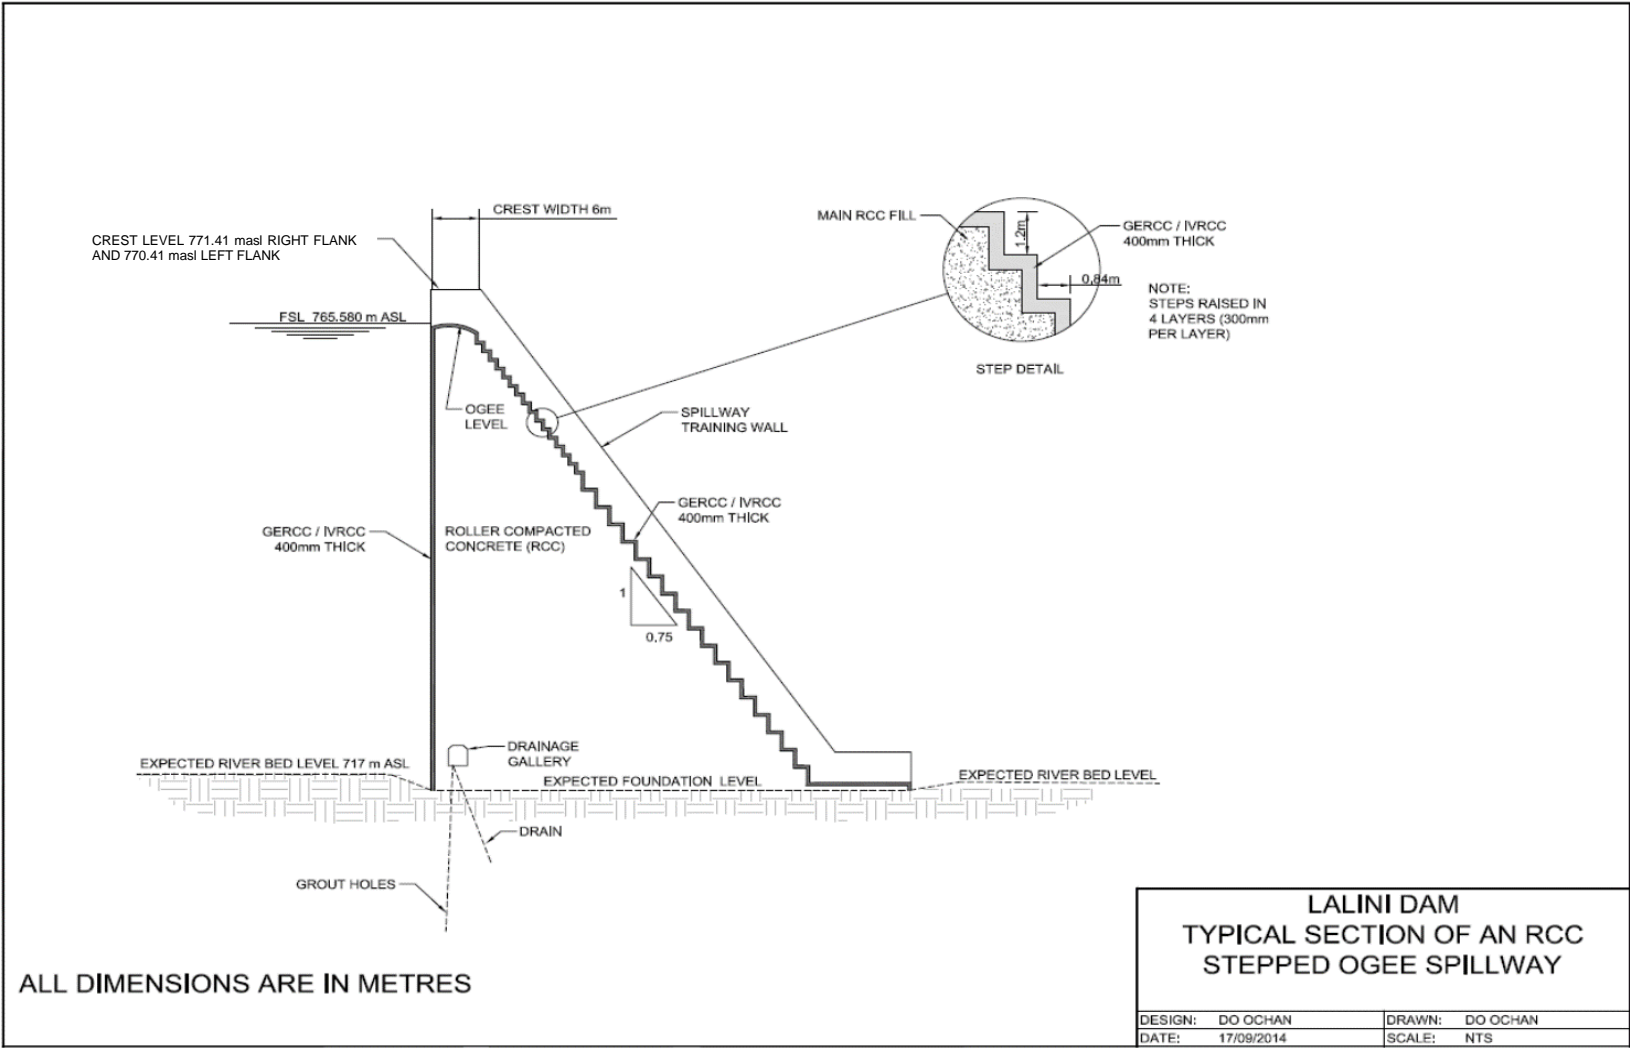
RCC Dam Wall and Spillway Typical Cross Section
